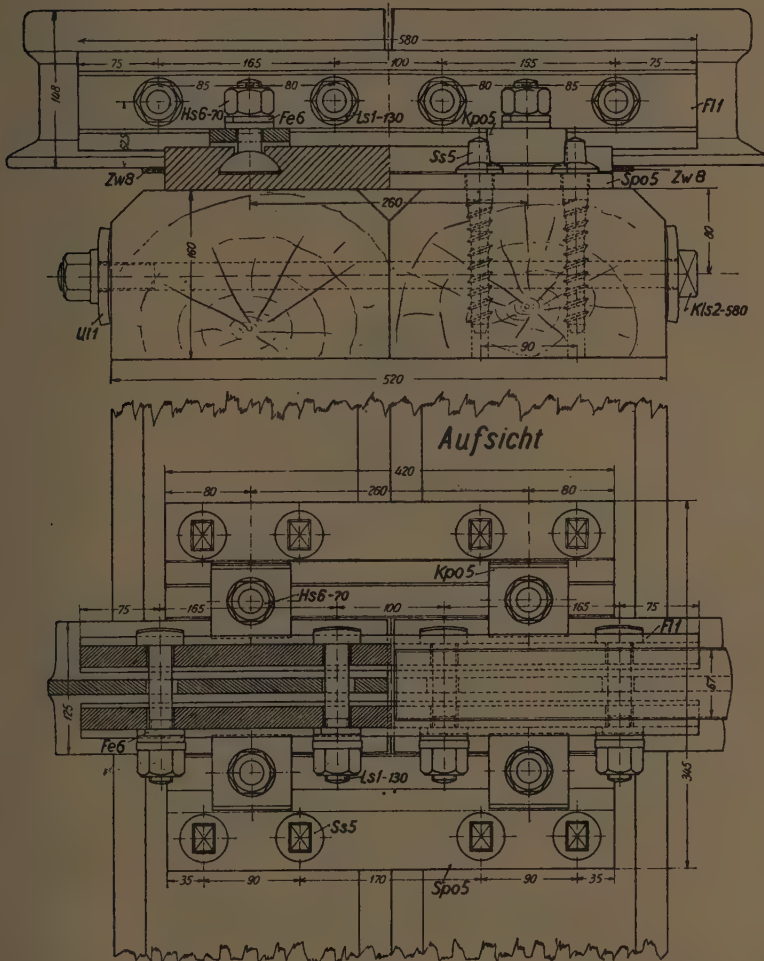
Rail joint with wooden sleepers. — Plan.
